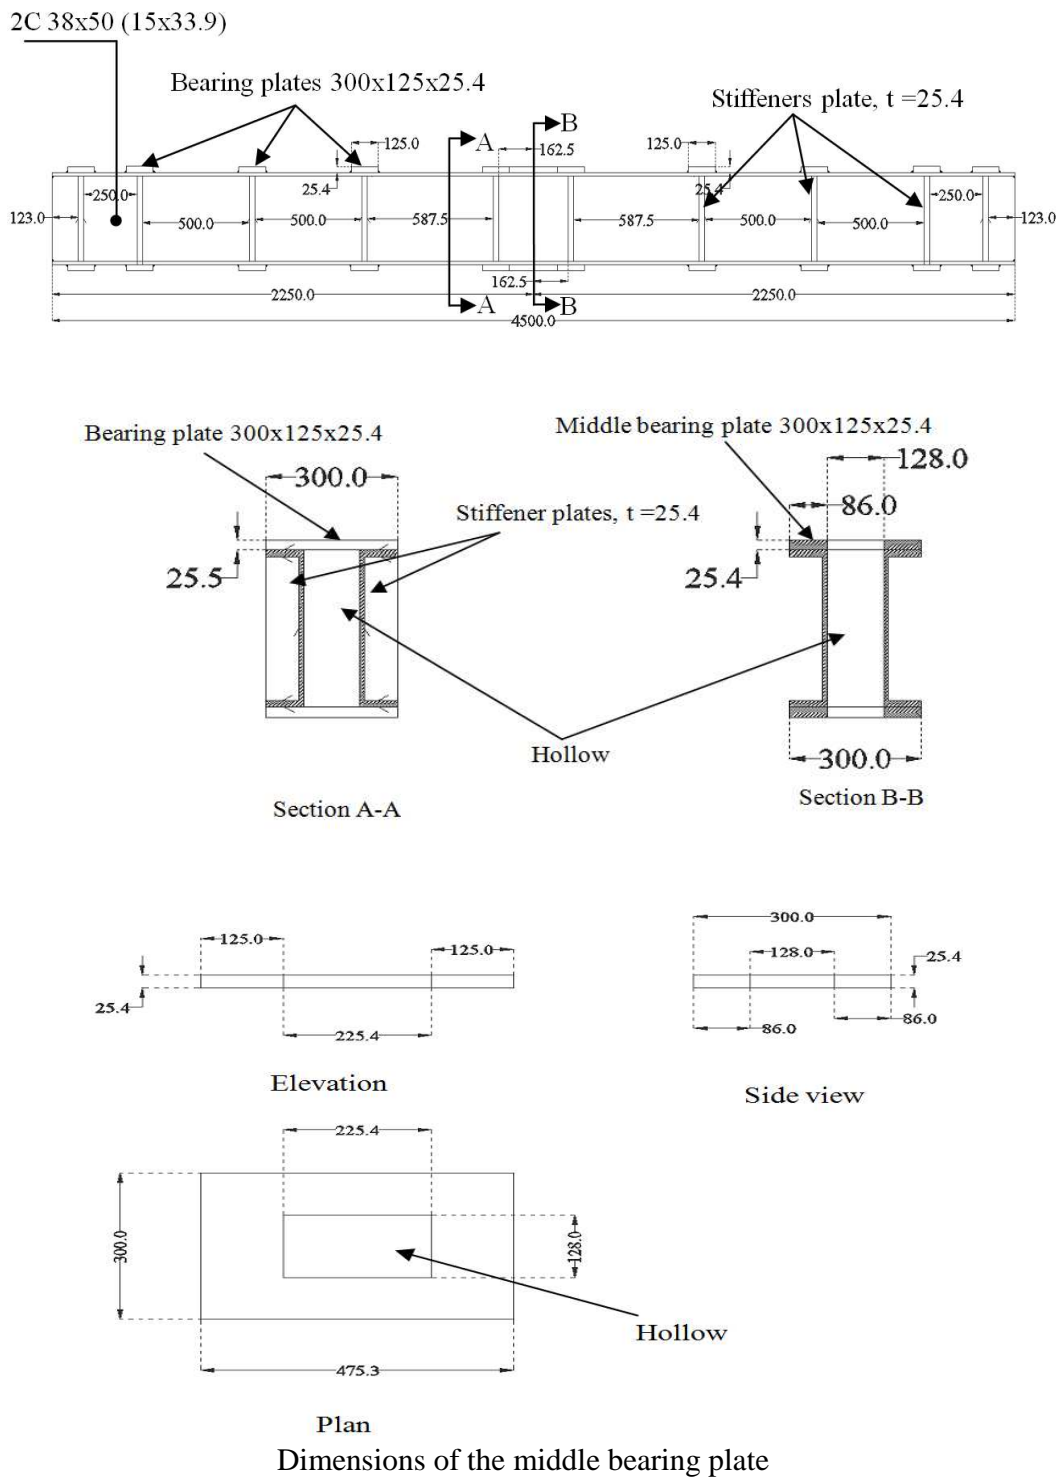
1. Cross-section and dimensions of main loading beam (dimension are in mm)
